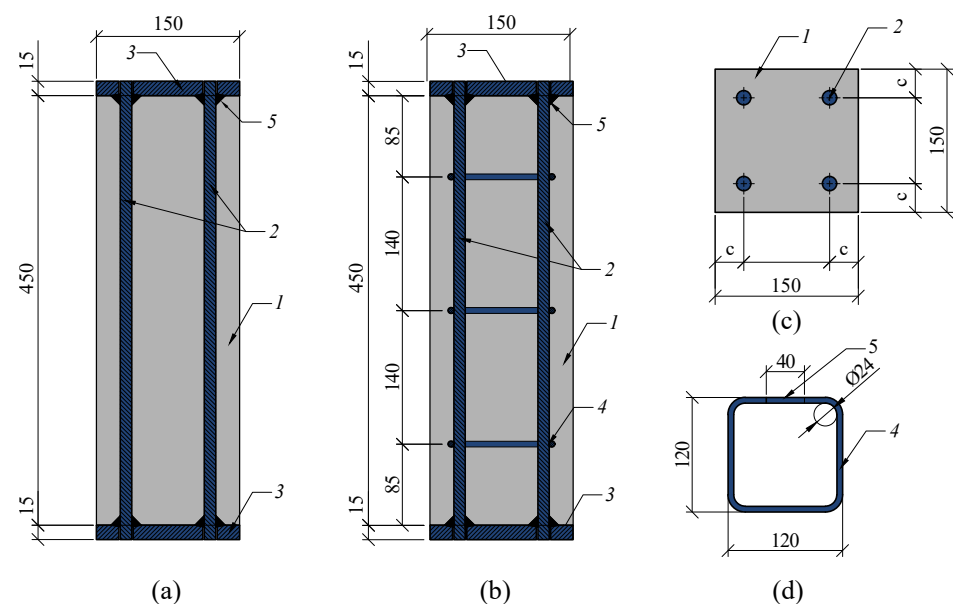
Specimens: (a) group 1 to 3; (b) group 4 and 5; (c) cross section; (d) geometry of stirrups; 1—concrete; 2—longitudinal reinforcement $\varnothing 12$ mm; 3—steel end-plates; 4—stirrups $\varnothing 6$ mm; 5—welded joint; c—distance 30 mm, 40 mm, and 50 mm.
